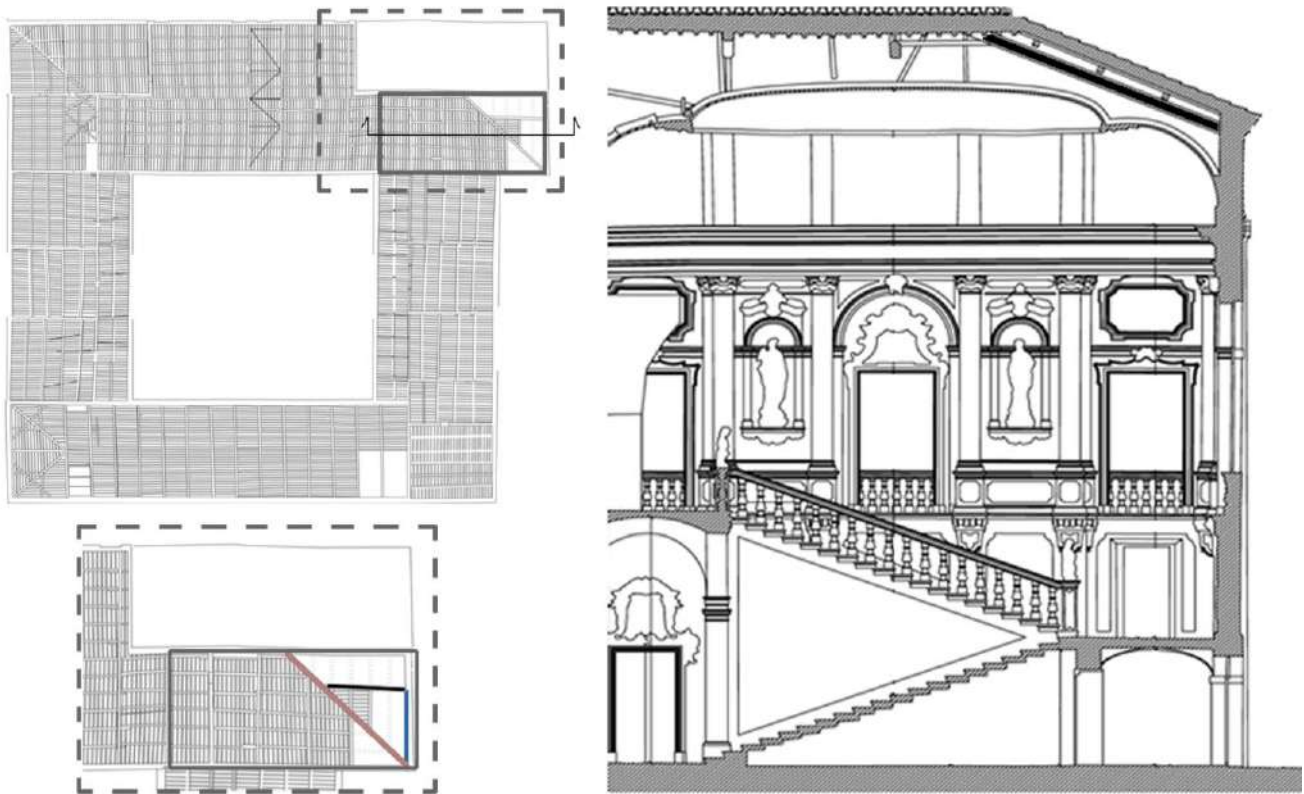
Left: roof plan of the palace with the detail of the staircase roof. In red the beam, in black the break-line crossbeam and in blue the wood chain. Right: section drawing of the staircase where we can see the break-line crossbeam
